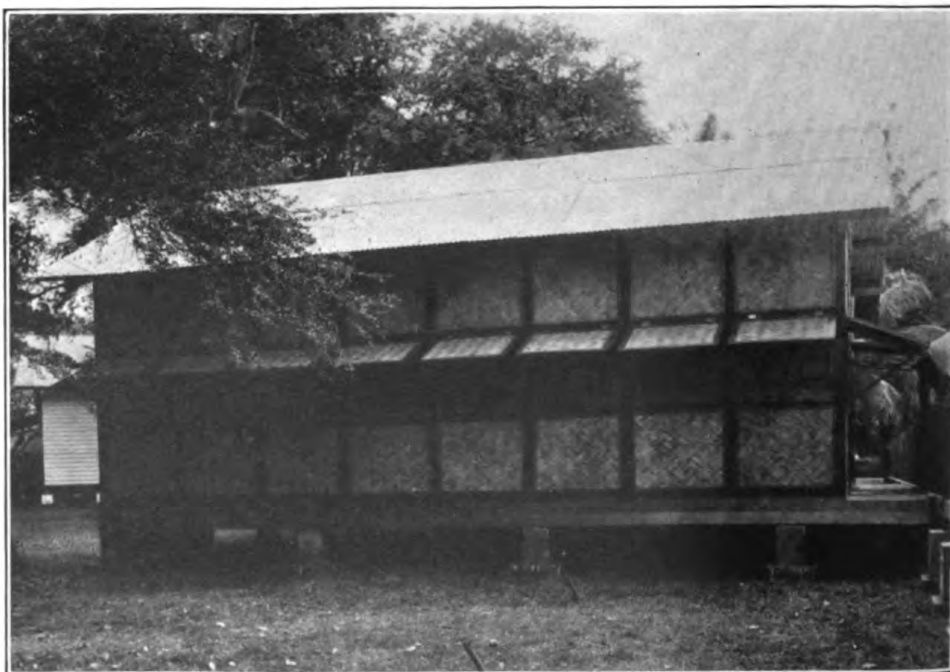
EXPERIMENTAL UNIT AT CANACAO WITH SUALI SIDE WALLS AND CORRUGATED IRON ROOFING
